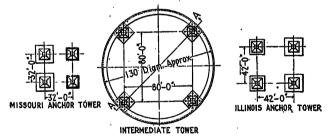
PLAN VIEW ALL FOUNDATIONS AND SCOUR APRON
